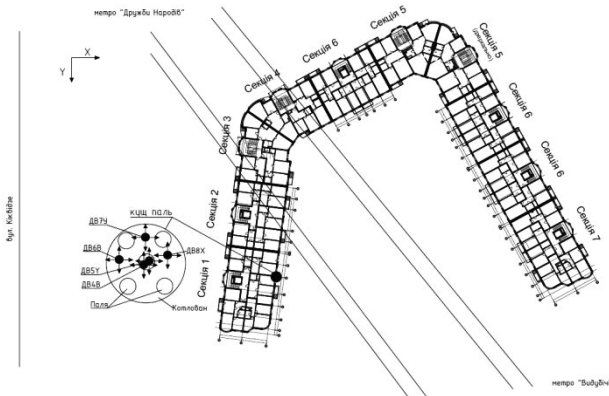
Location of sections of buildings, tunnels underground at the construction site and the vibration sensor (IR) on the ground and piles section number.
